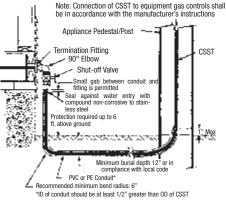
Fixed Outdoor Appliance (Underground Routing)
